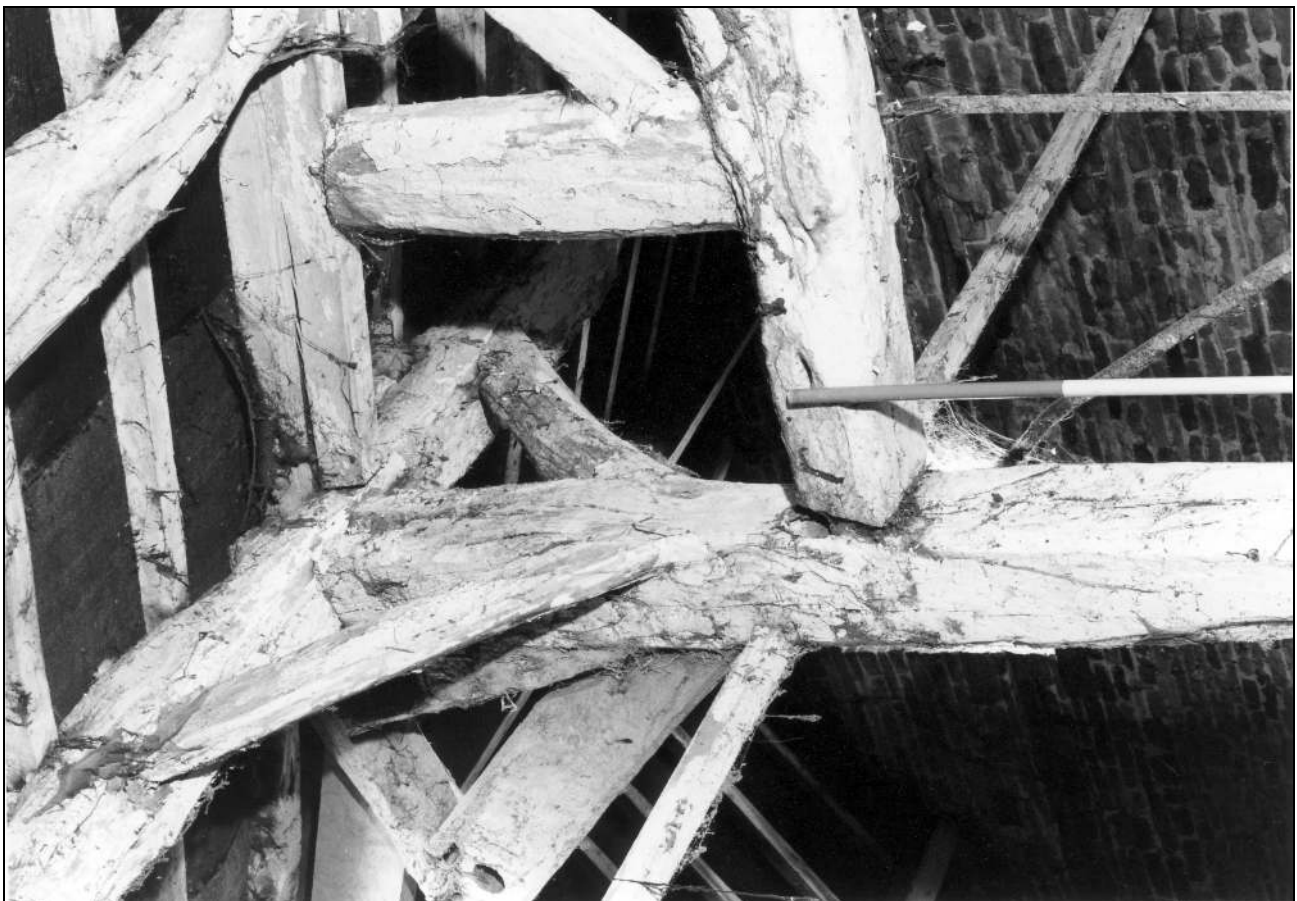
Truss 1: head of arcade post etc, from the north-west (film 6, frame 10)
